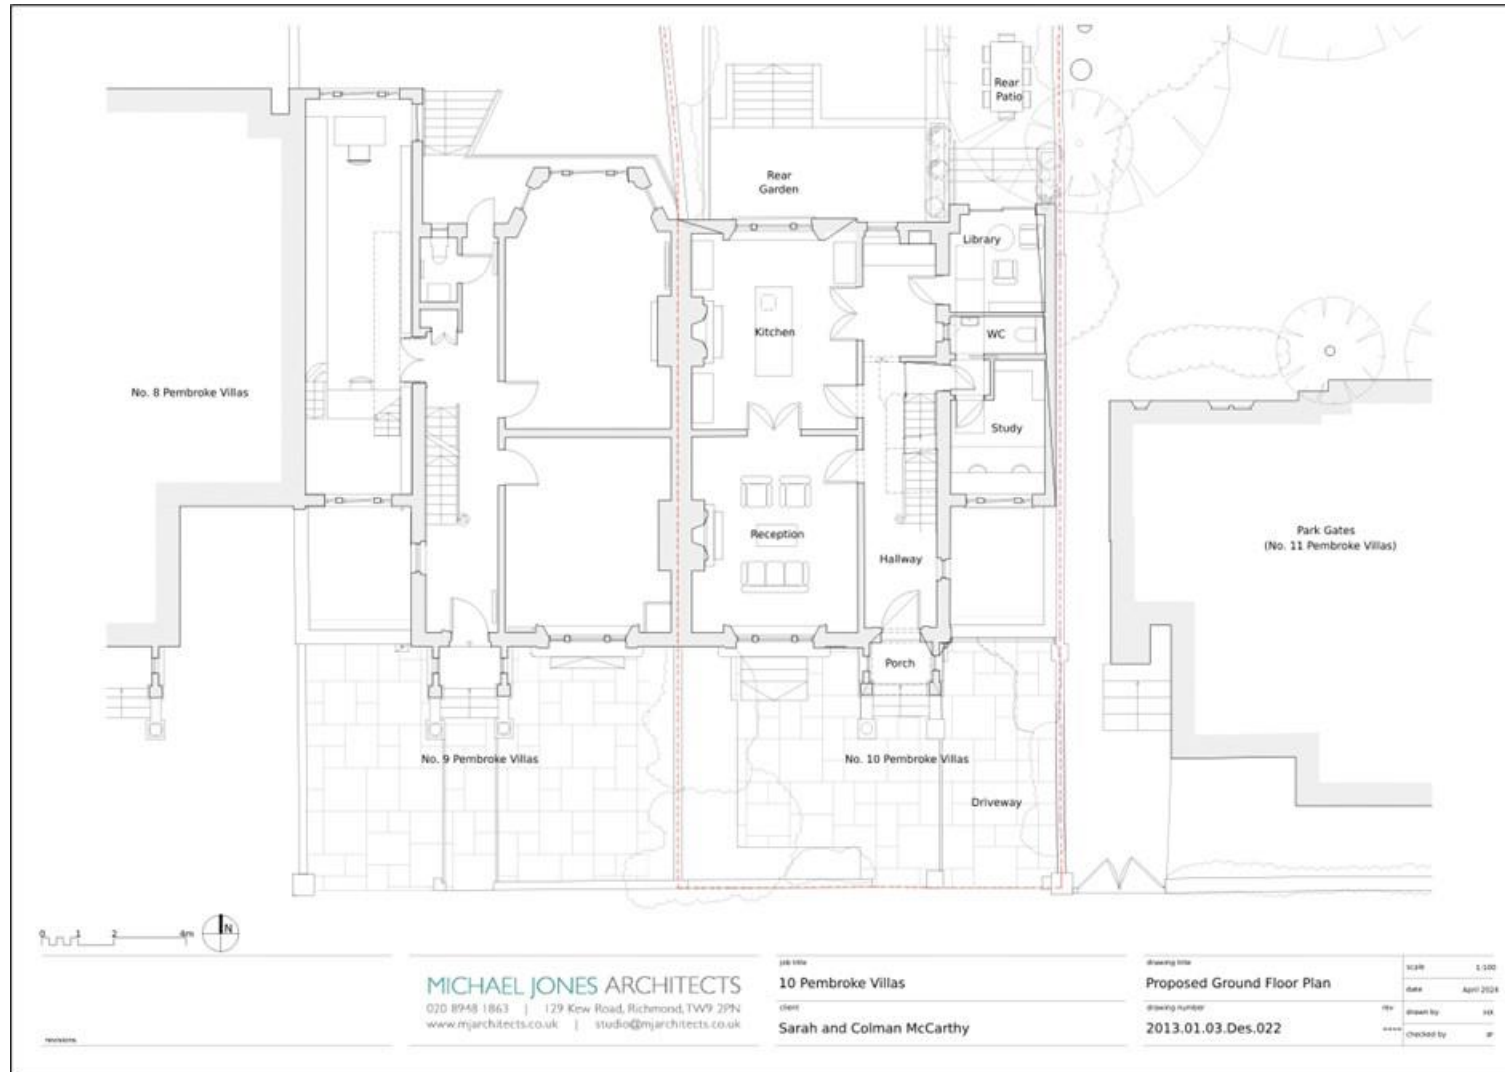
Proposed ground floor plan (Reproduced courtesy of the client).
